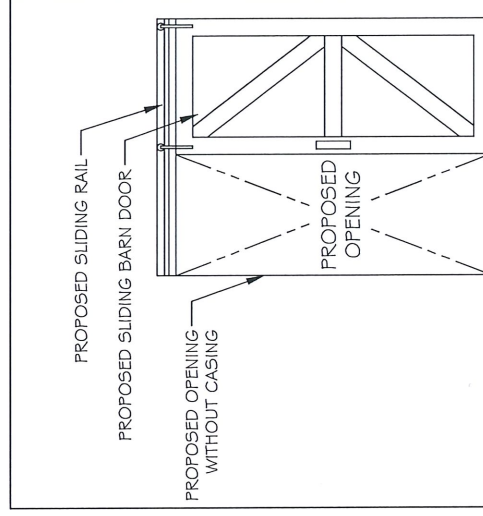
EXHIBIT A: DOOR MODIFICATIONS TOP PLAN
